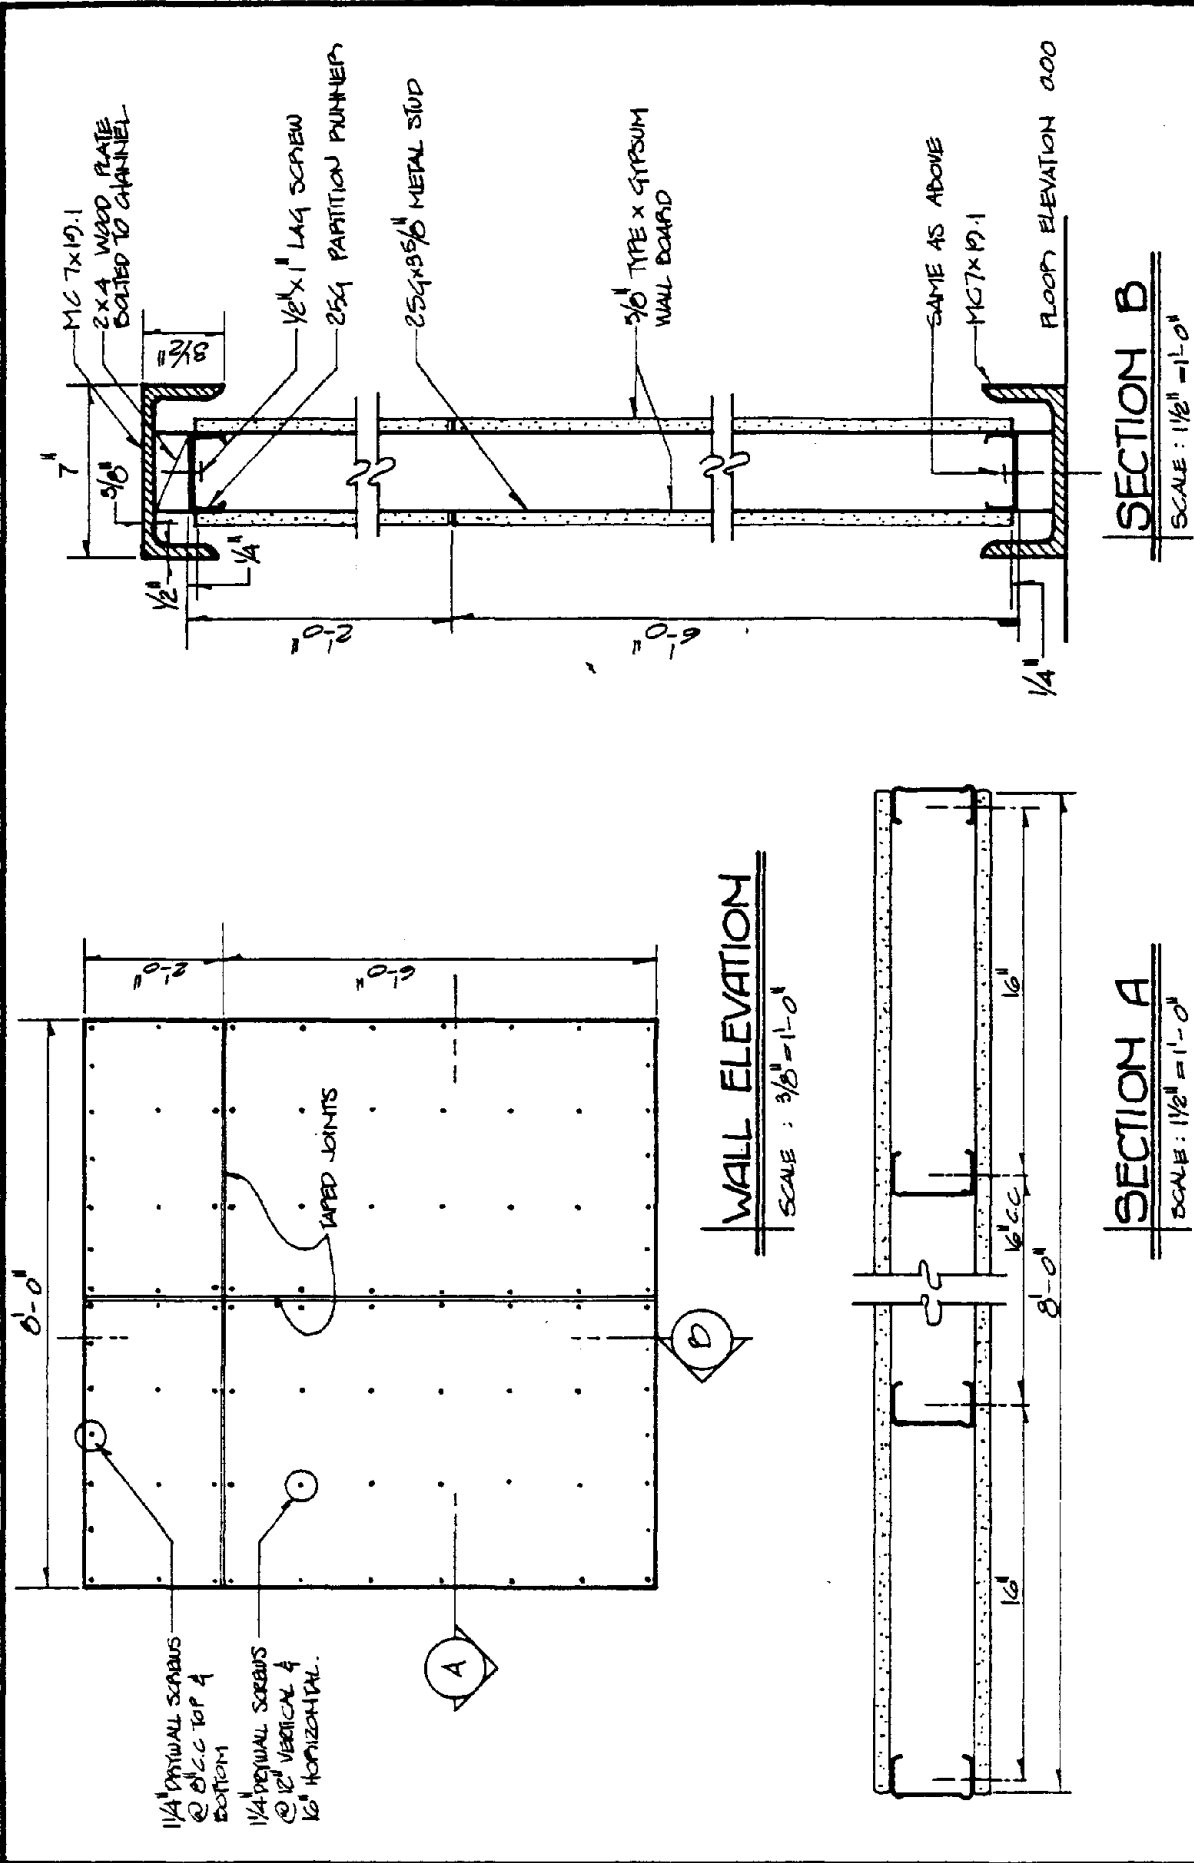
FIG. II. PARTITION TEST PANEL SPECIMEN P8A
